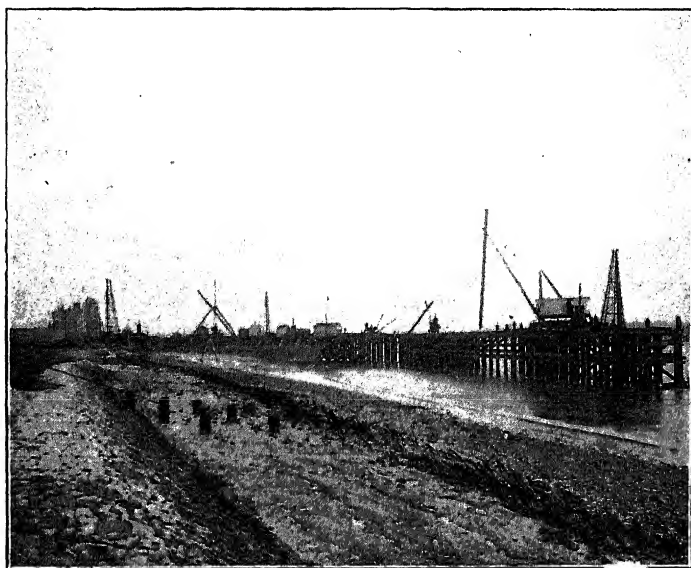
View of Tilbury pier (1906) built of "Burnettized" Timber.
